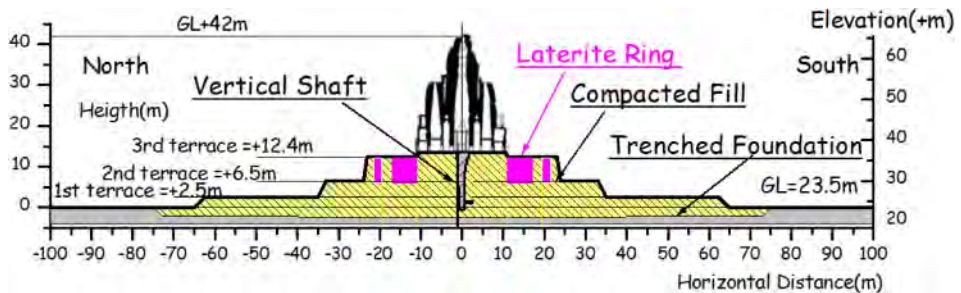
Trenched foundation with filled high mound of Bayon, N-S Section.
